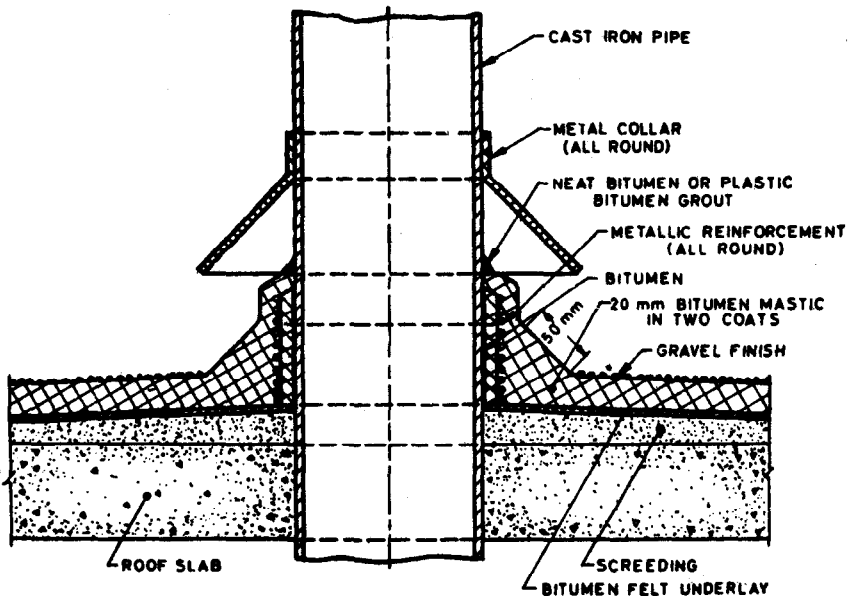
TREATMENT WHEN A PIPE PASSES THROUGH A ROOF SLAB
